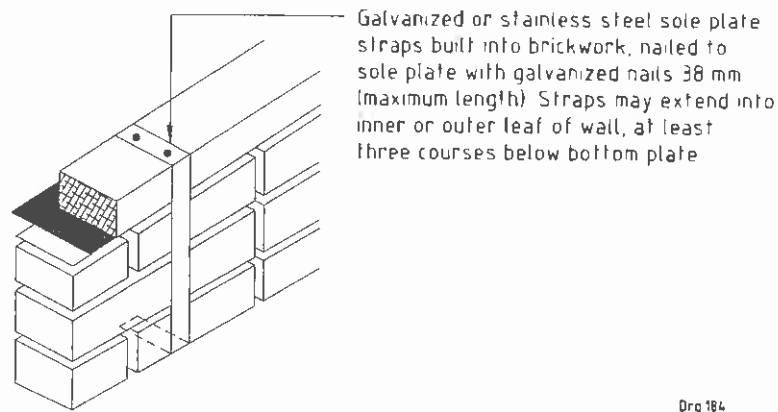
Fixing sole (sill) plate to brick/block foundation walls using steel straps
